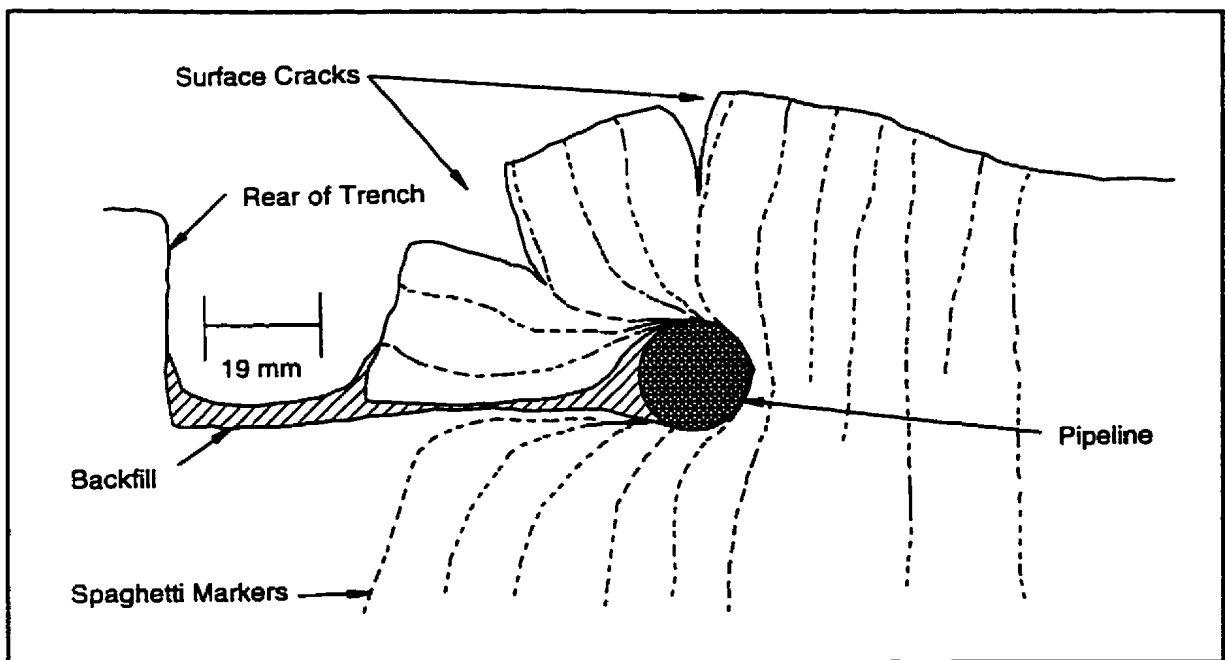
Sketch of excavated cross-section along mid length of model pipeline #4, 30mm wide trench, Test 03.
